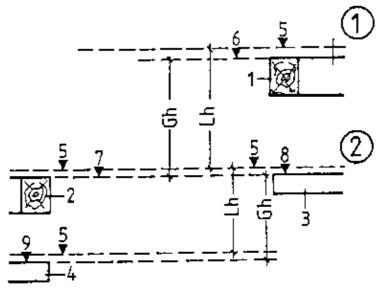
Connection between stairwell height and stair flight height – (1) with wood joist ceiling (2) with solid ceiling – 1 upper stair–apron, 2 lower stair–apron, 3 upper solid ceiling, 4 lower solid ceiling, 5 surface of finished floor, 6 surface of upper stair–apron, 7 surface of lower stair–apron. 8 surface of upper bare ceiling (solid ceiling), 9 surface of lower bare ceiling – GH stairwell height, Lh stair flight height
